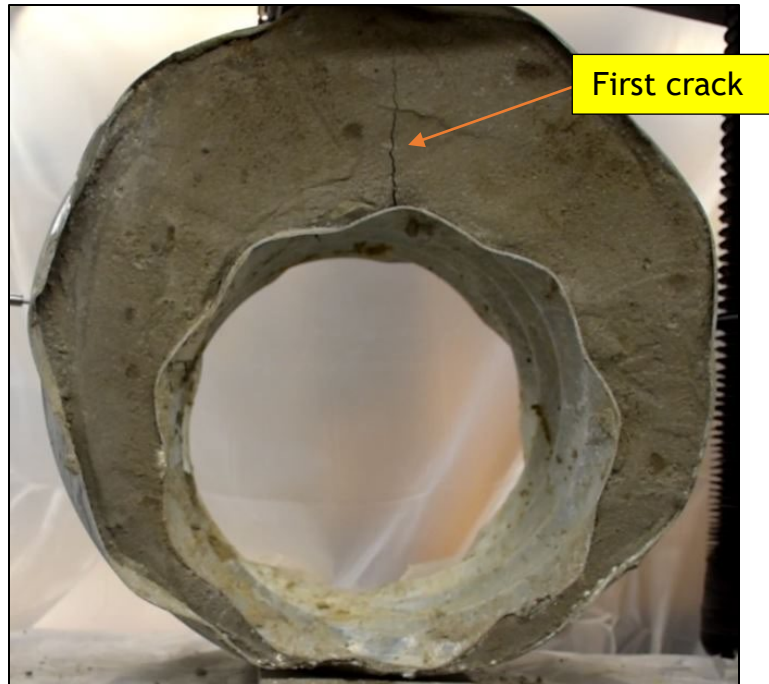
First Crack in Culvert with No Voids Grouted with Mix A-5 (at 3000 lbf).
